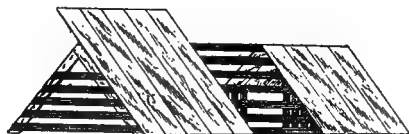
A-Shaped Coop with Pen and Movable Shelter Board.
